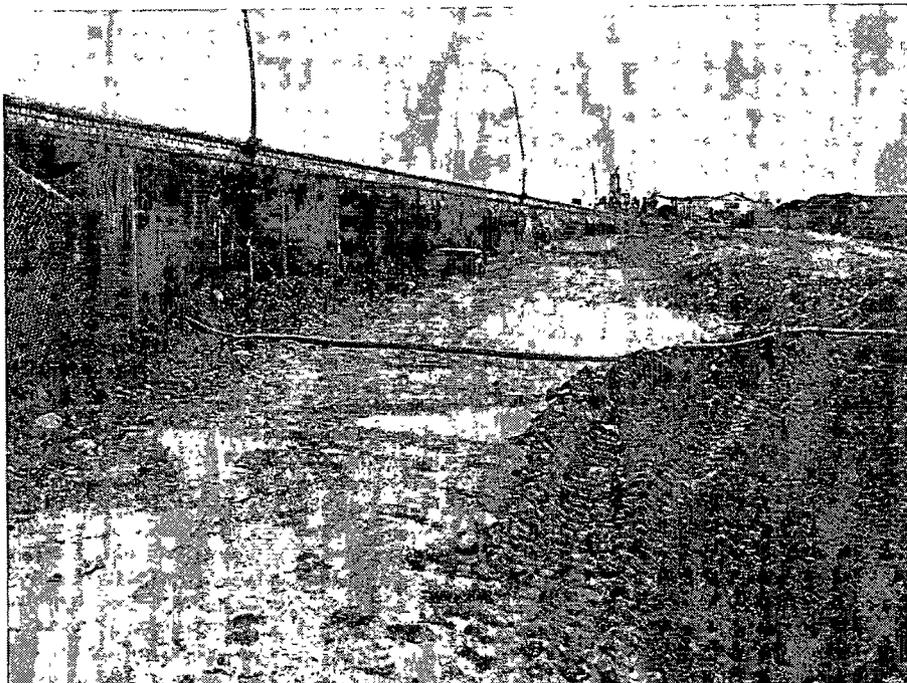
Storm drain on Caltrans right of way (East side project boundary)
